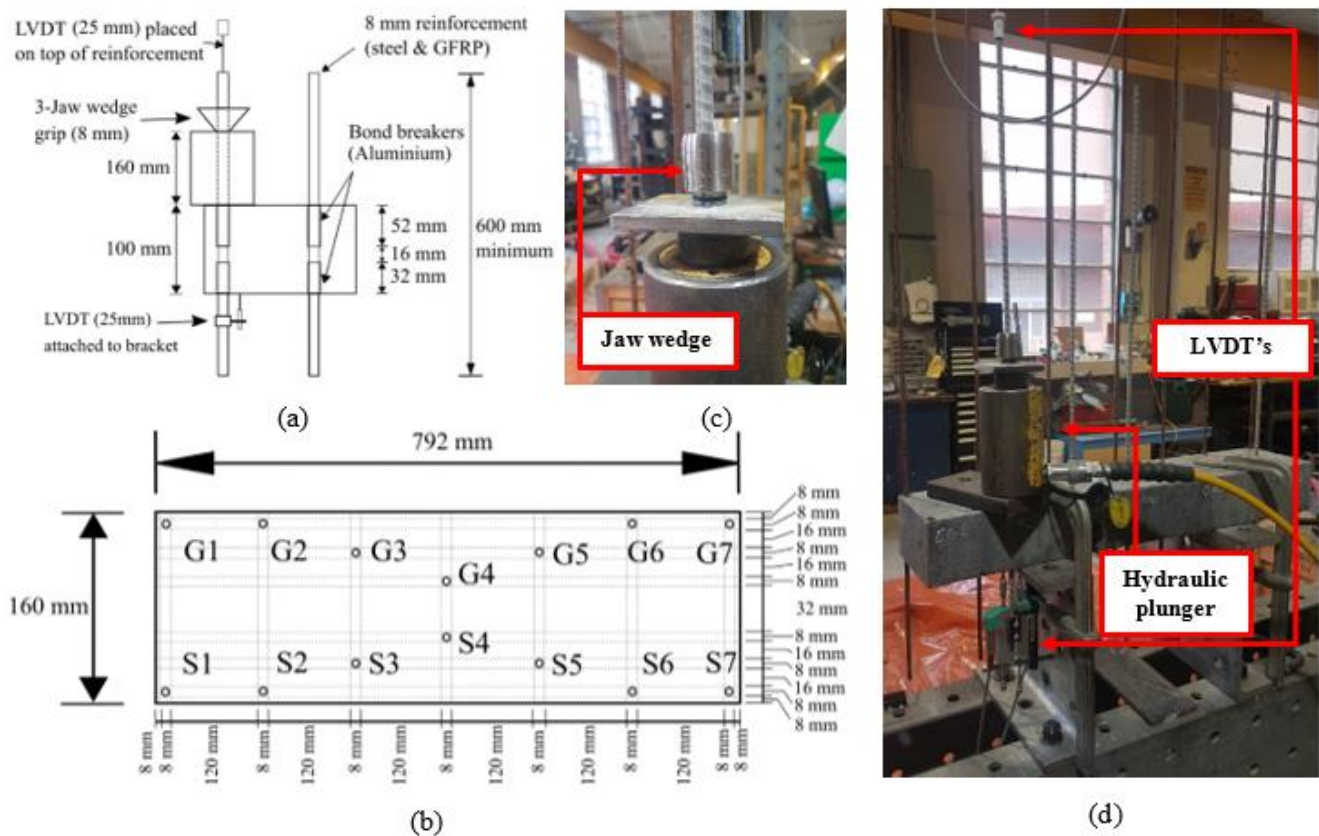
UHPC pull-out block design: a) elevation view; b) plan view; c) cylinder with plate and wedge; and d) pull-out test set-up.
